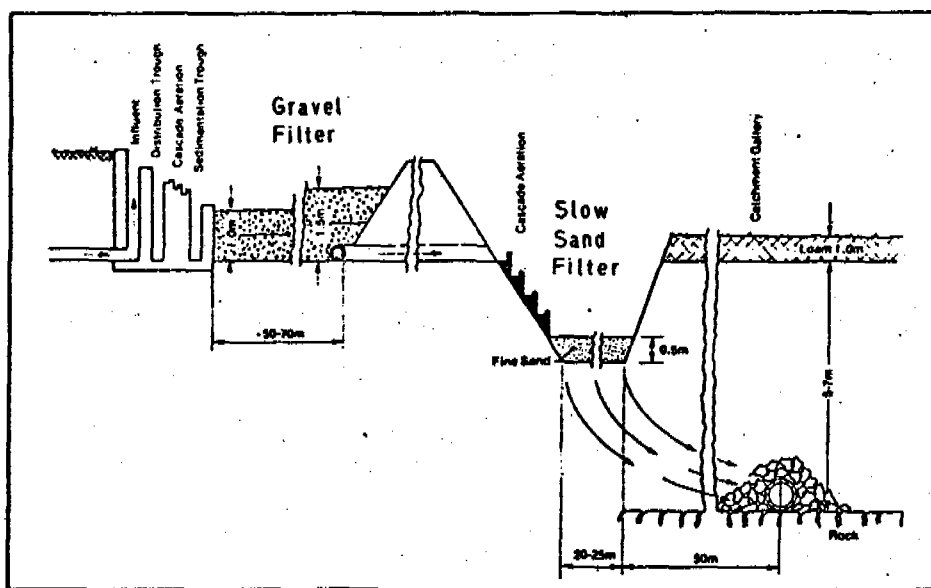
Layout of the artificial groundwater recharge plant of Dortmund²
